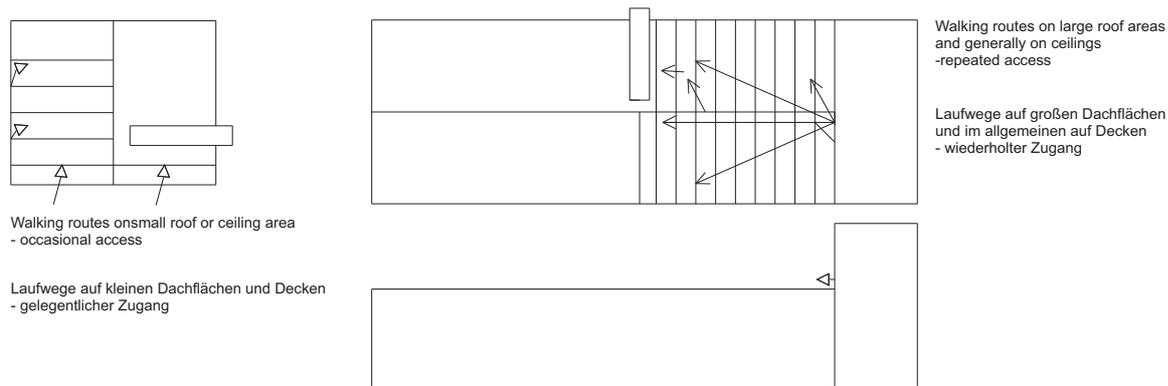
Walking pattern on ceilings, small roofs and on large roofs
